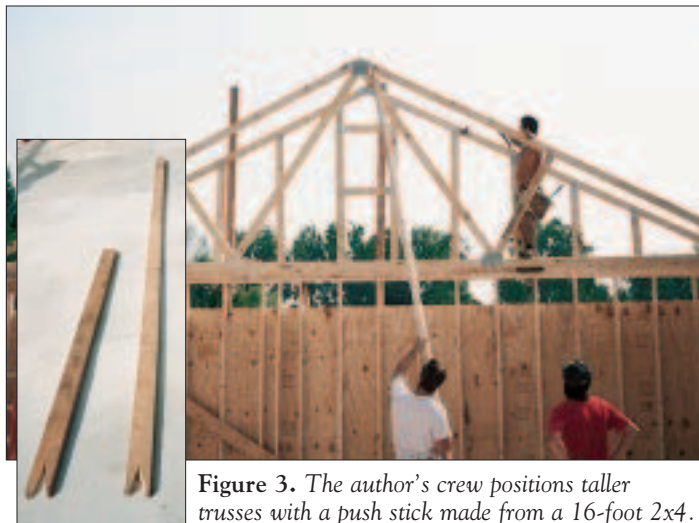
The author's crew positions taller trusses with a push stick made from a 16-foot 2x4.
